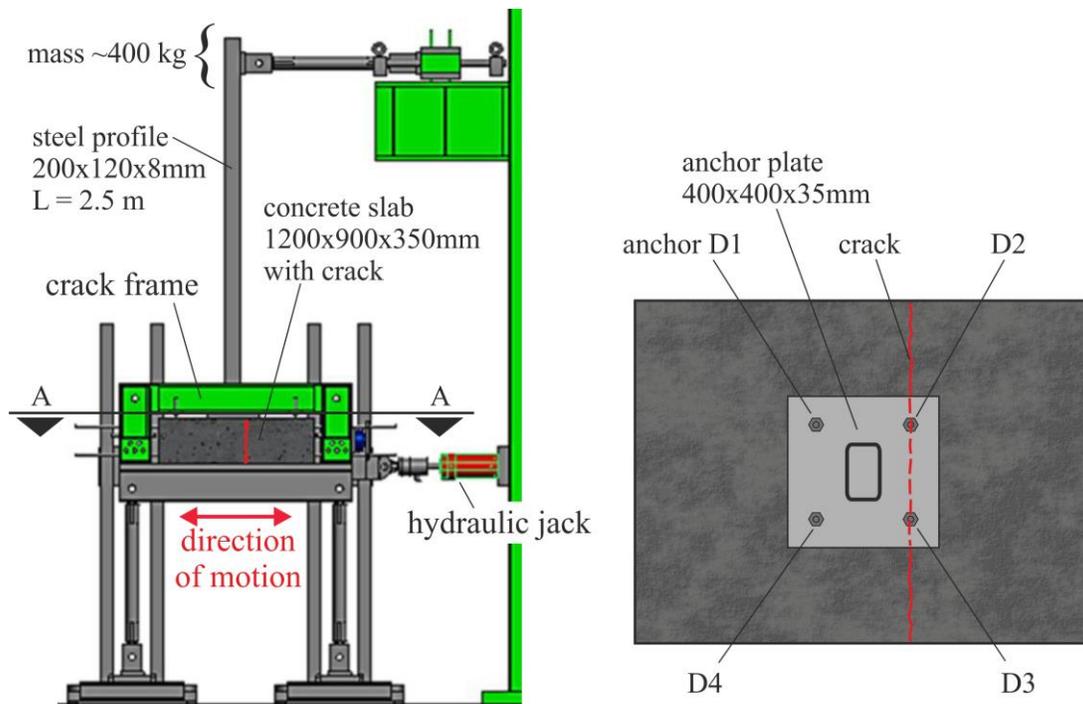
Elevation view of test setup (left) and top view (A-A) on concrete slab with anchor plate (right)
